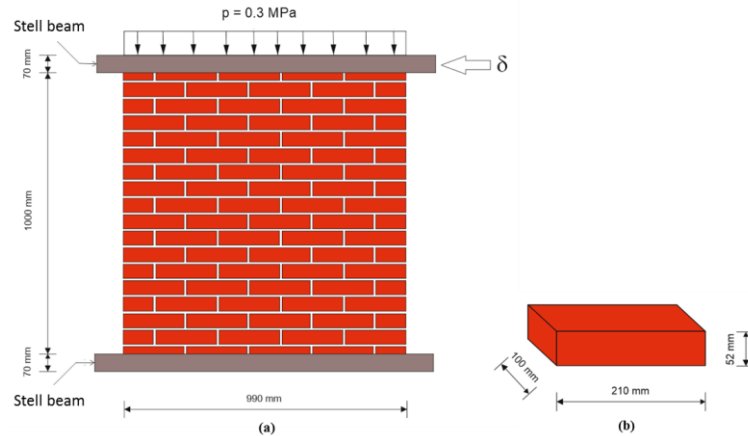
(a) Masonry wall geometry (b) masonry unit used in the wall.
